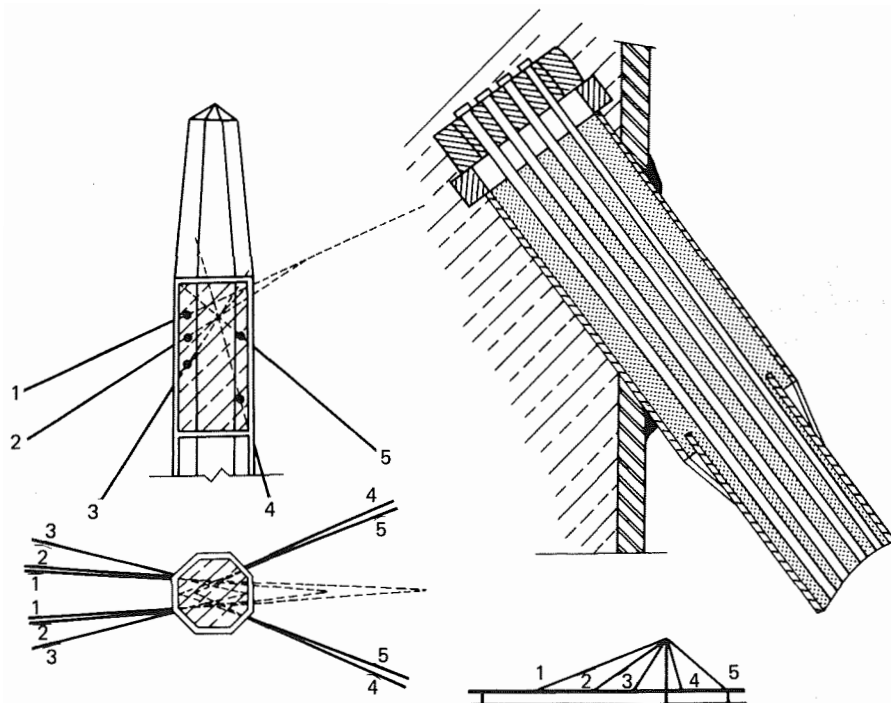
Schillerstrasse Footbridge, tower anchorage details. (Courtesy of Die Bautechnik, from reference 21.)
